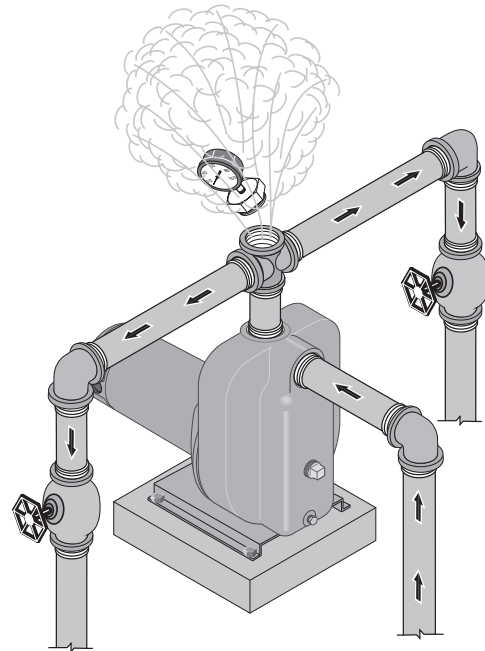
REMOVE PRIMING PLUG AND FILL PUMP BEFORE STARTING
